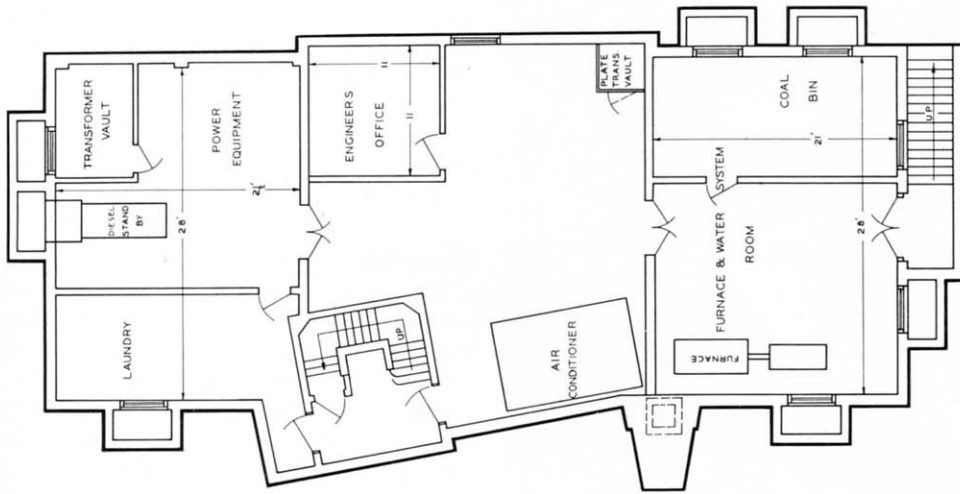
Floor plan at left shows the layout of facilities in the basement of building. Top floor (not shown) contains two family apartments.
